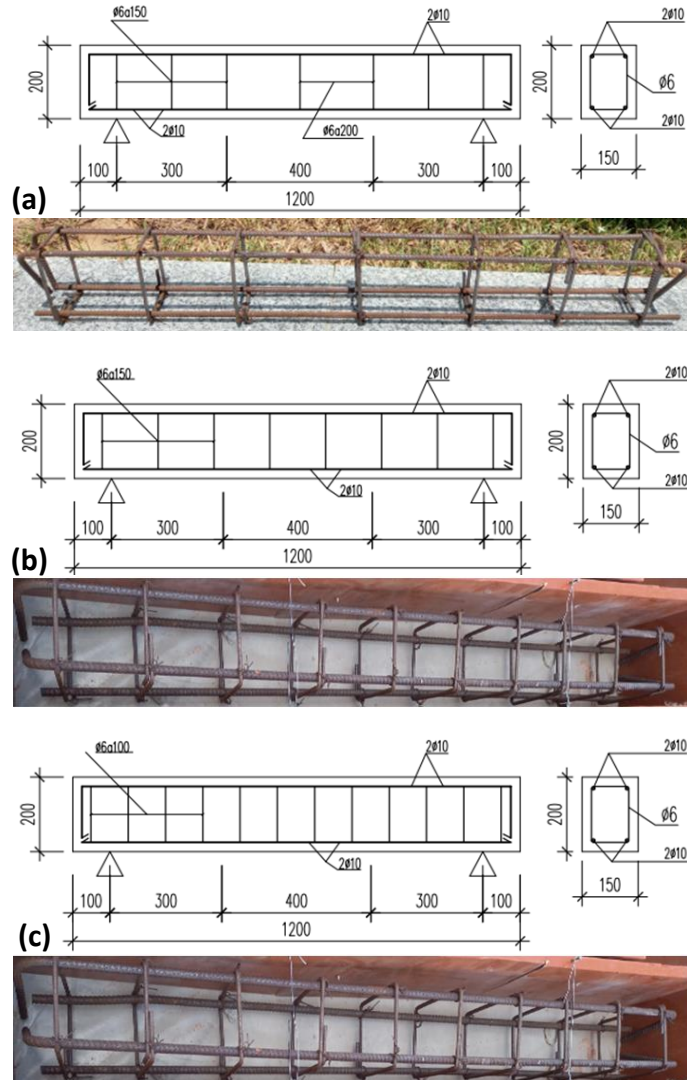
Design of reinforced concrete beams: (a) group 1 beams, (b) group 2 beams, (c) group 3 beam
